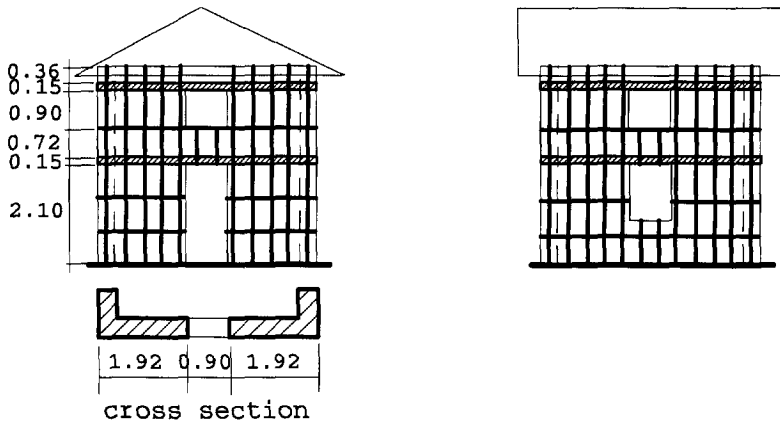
Front wall and side wall of a two-storey house (measures in mm)
